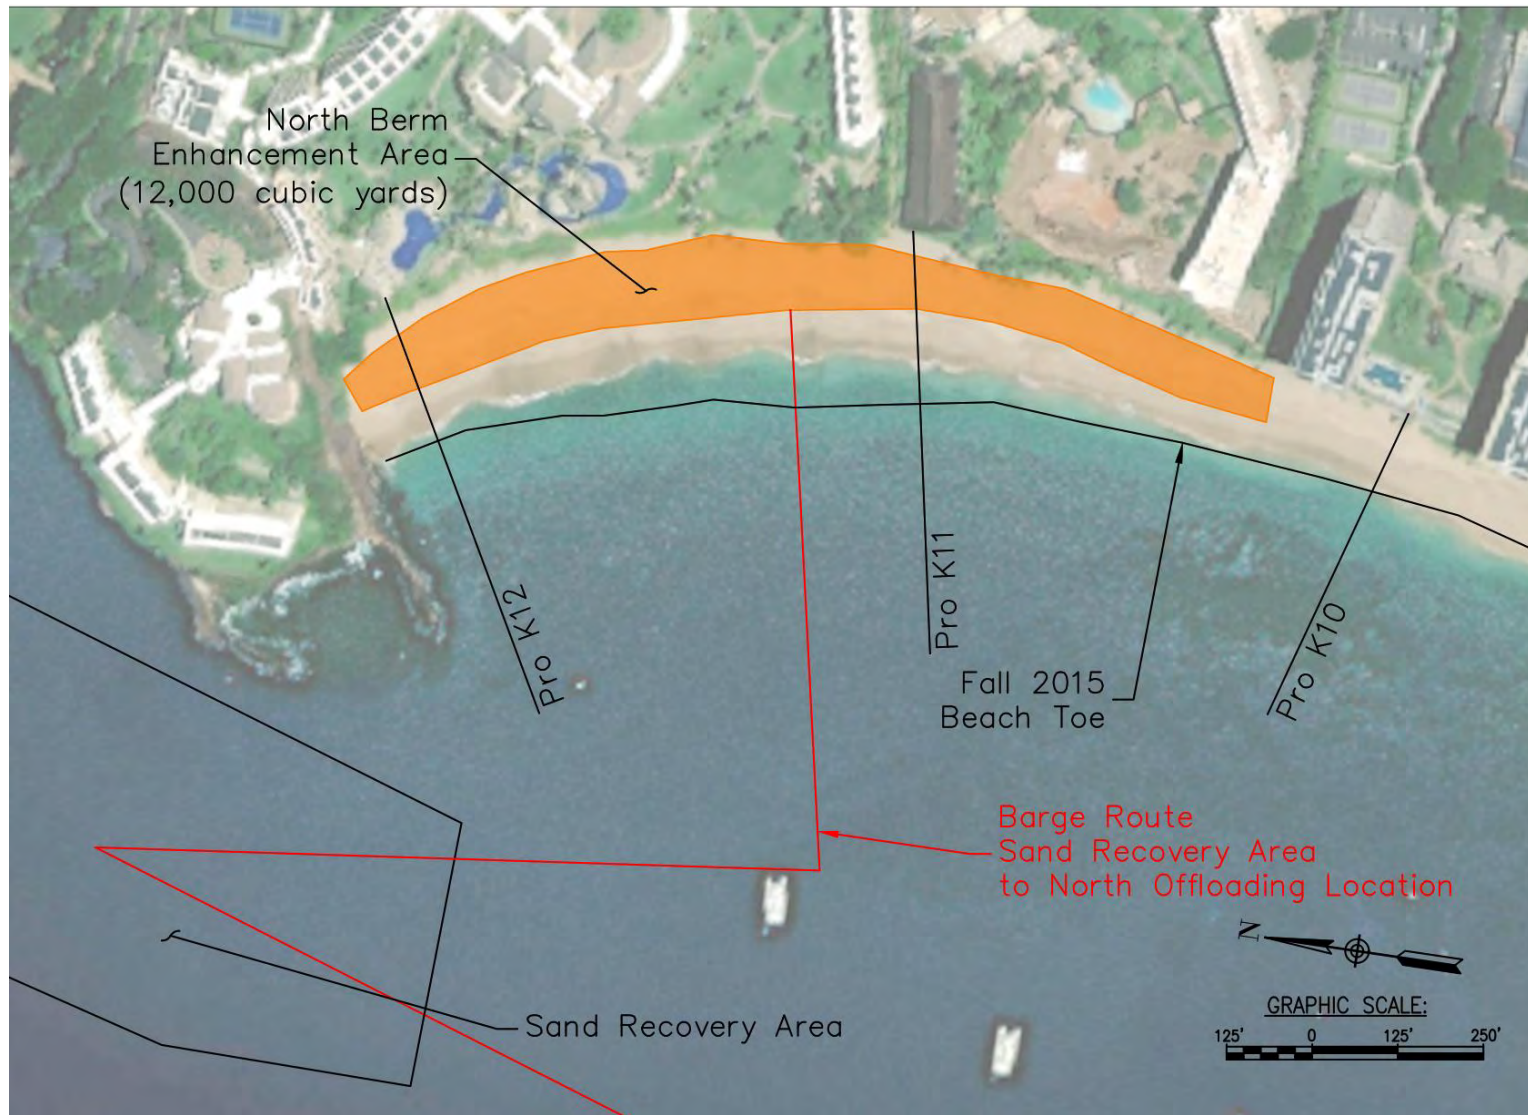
North Pu'u Keka'a Berm Enhancement area – Plan View.
